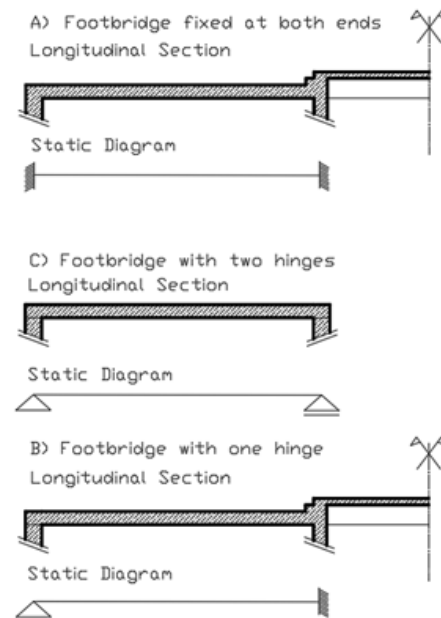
Longitudinal sections and structural diagrams of the considered structural variants of the footbridge.
